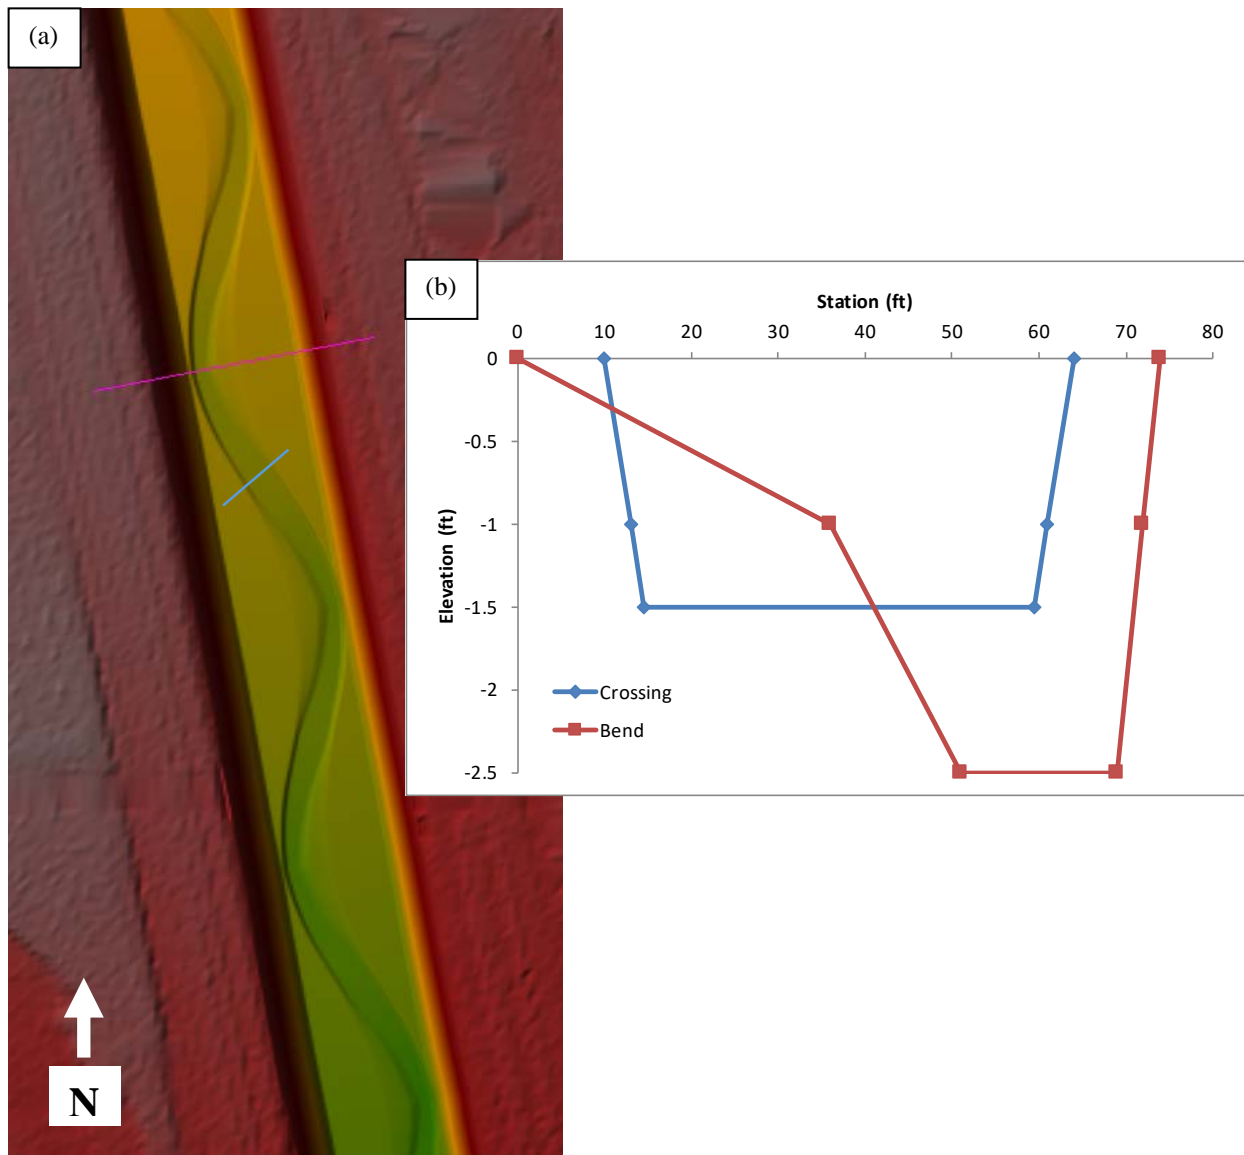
Conceptual design geometry for a meandering low-flow channel with pools and riffles: (a) plan view of channel layout (b) cross section view at channel bend (looking downstream from plan view pink line location) and crossing (blue line) showing depth below existing concrete bed. Low-flow channel dimensions were designed to contain about 300 cfs. For reference, the straight and uniform existing low-flow channel has a top width of 20 ft and a depth of about 0.5 ft, which contains about 75 cfs.
